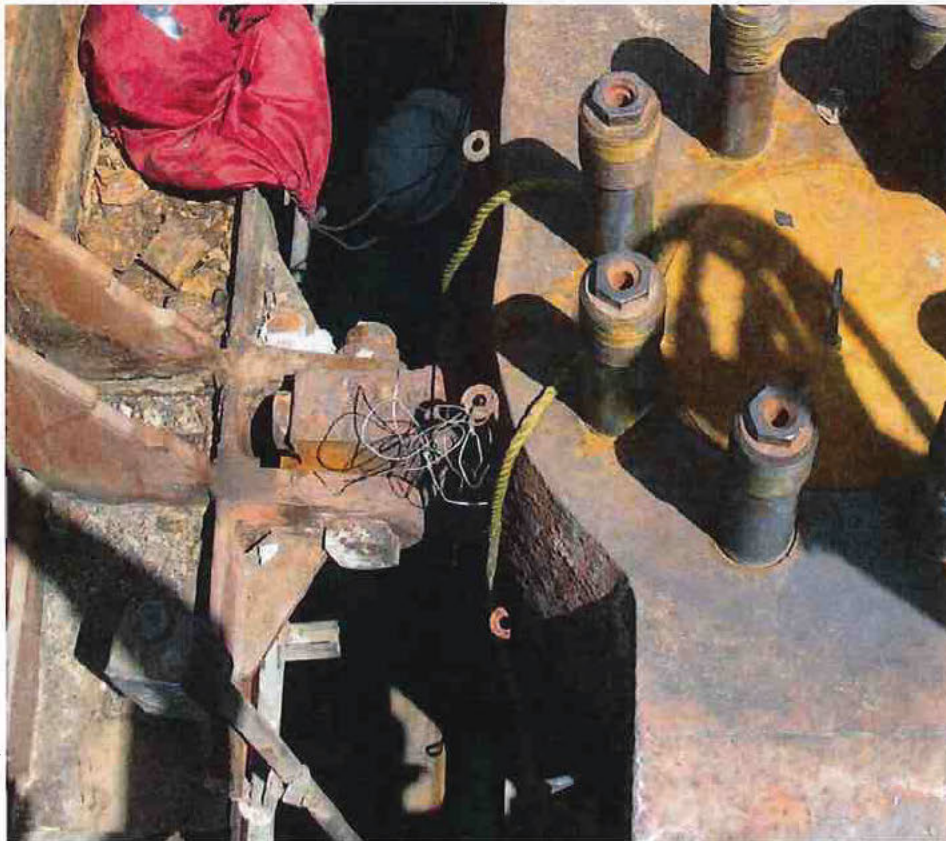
U-6 Control Valve Actuator Assembly Connection
